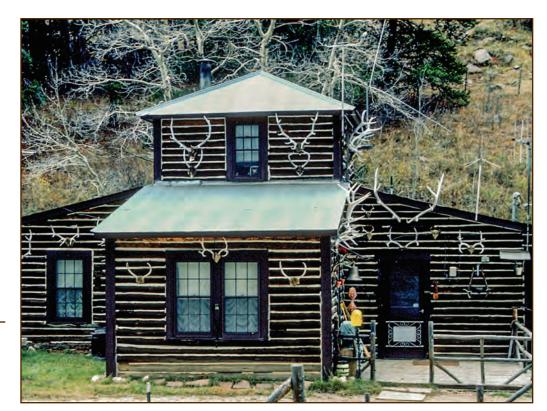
This fancy log house has corrugated galvanized steel panel roofing. Roofers used matching galvanized steel ridge covers on the pyramidal second floor roof.
